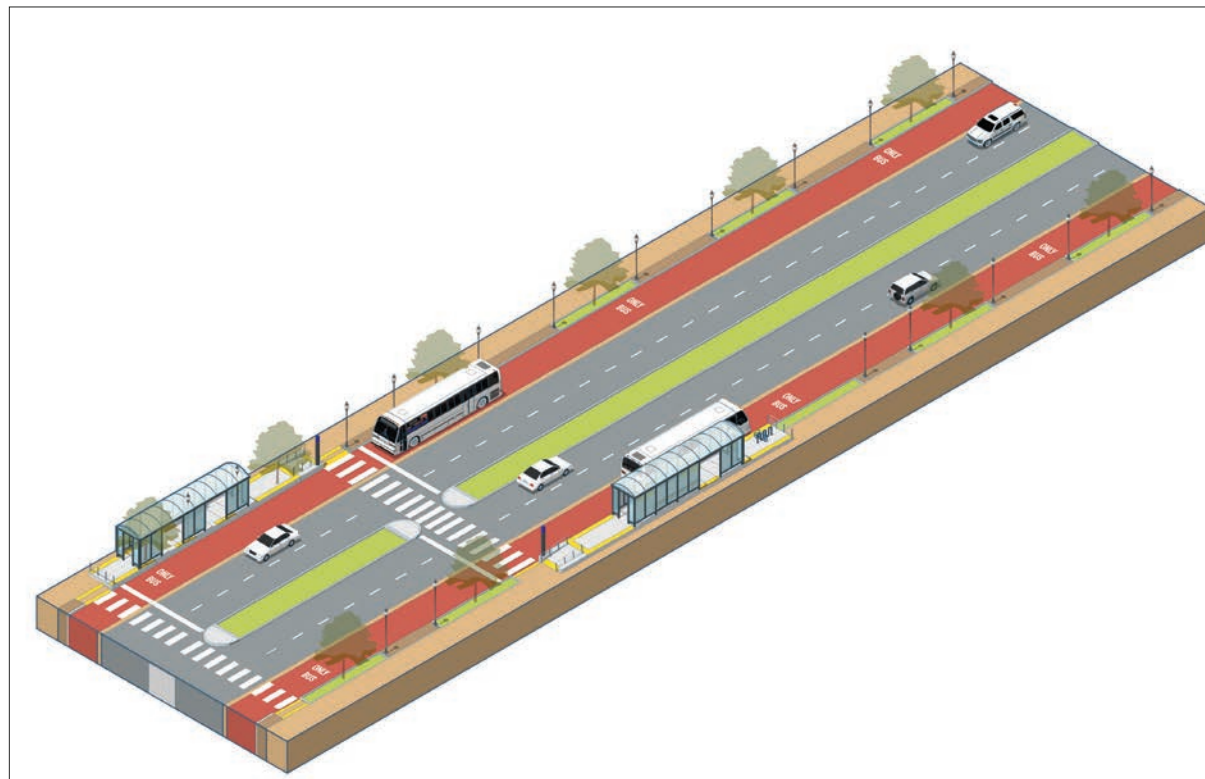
CROSS SECTION OF BRT AT STATION LOCATION
